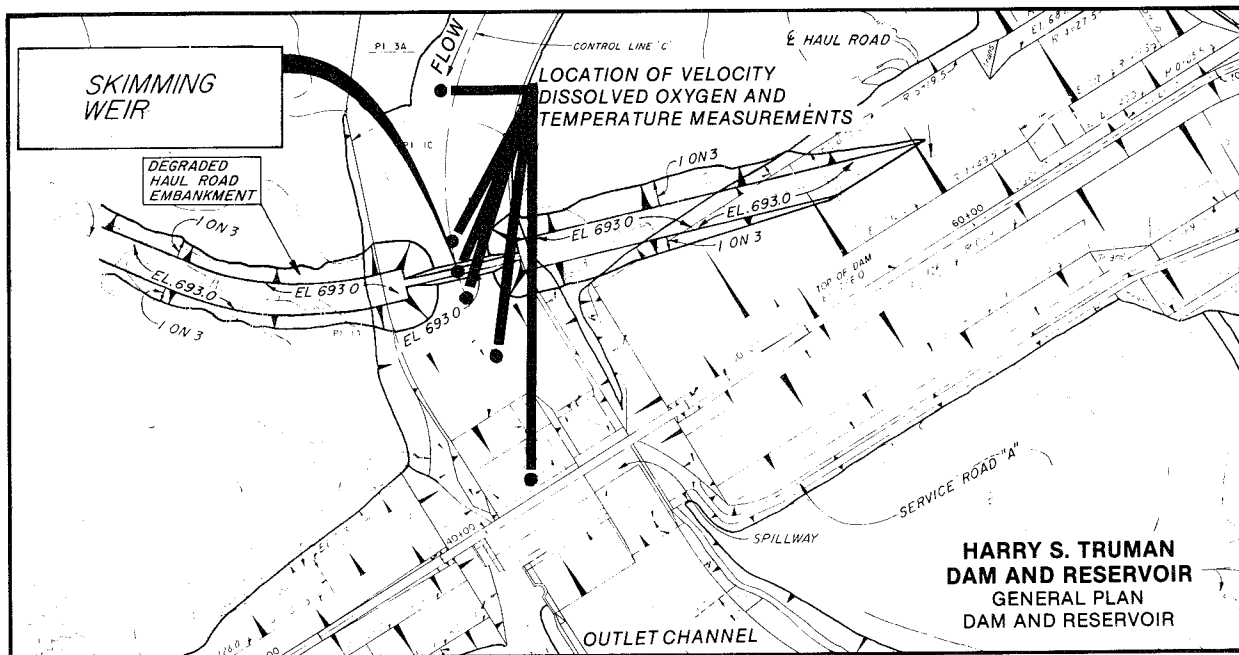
Plan View of Harry S. Truman Dam and Upstream Skimming Weir
